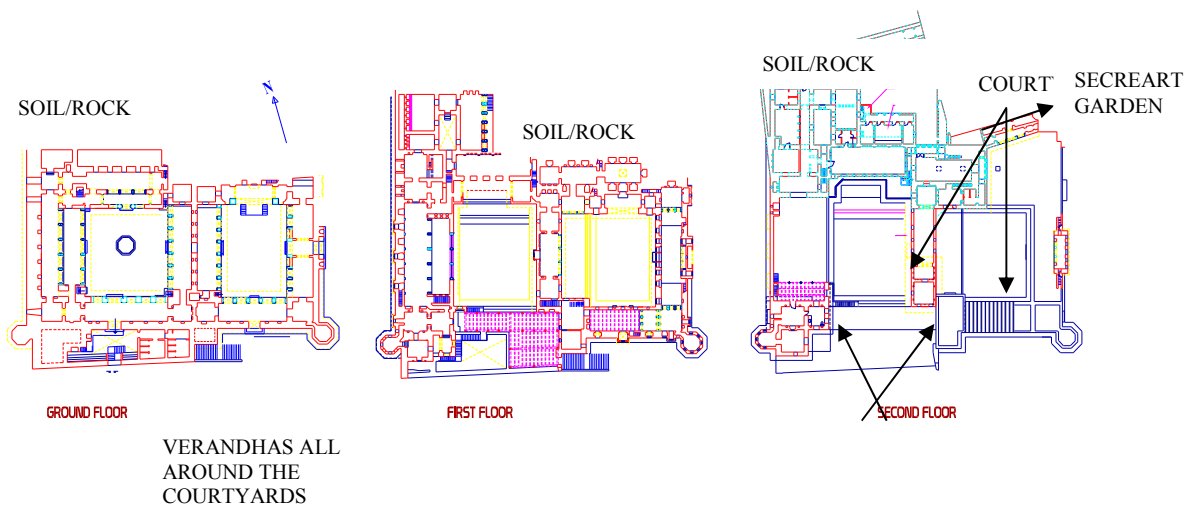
Sectional plan of all the three floors Gohar Mahal<sup>11</sup>
